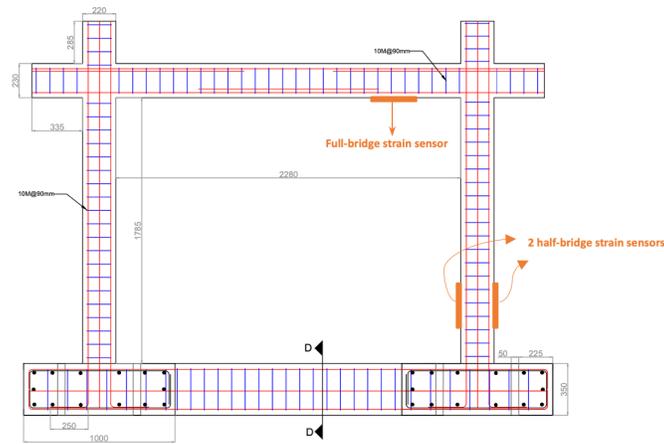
Front view of the RC frame and steel reinforcement(all dimensions in millimetres)
